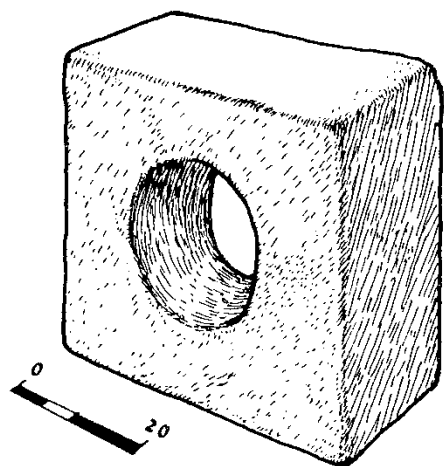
Stone segment found close to the pipe aqueduct, possibly used to strengthen the pipe of a siphon (author).
